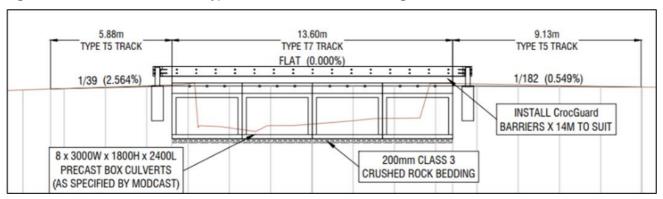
Cross-sectional view of typical detail for a box culvert design for a large channel
